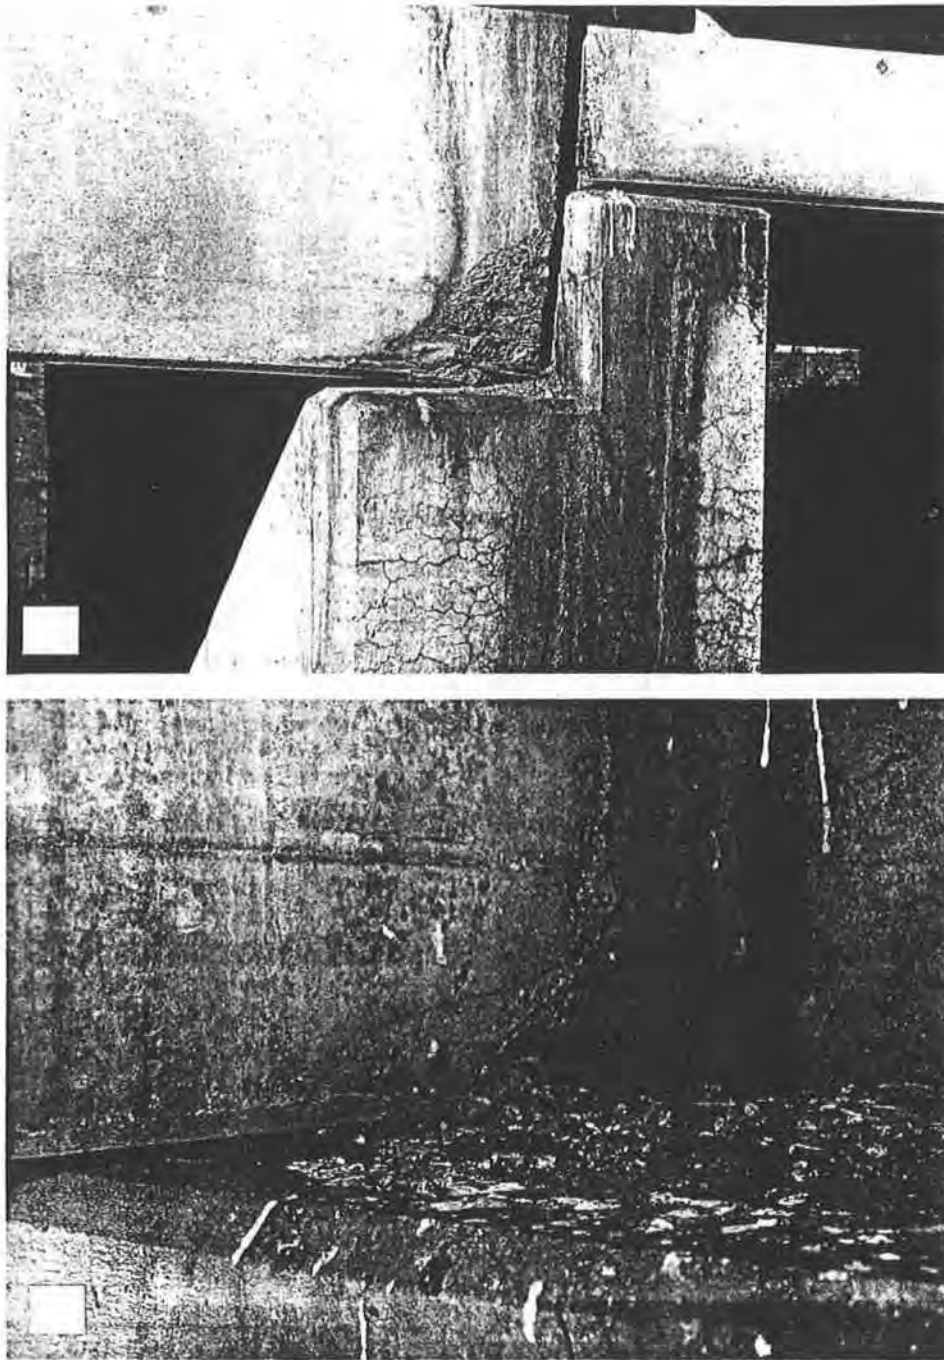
Concrete Deteriorations at Beam Ends at Pier and Abutment Due to Water Leakage Through Faulty Joints [17].
